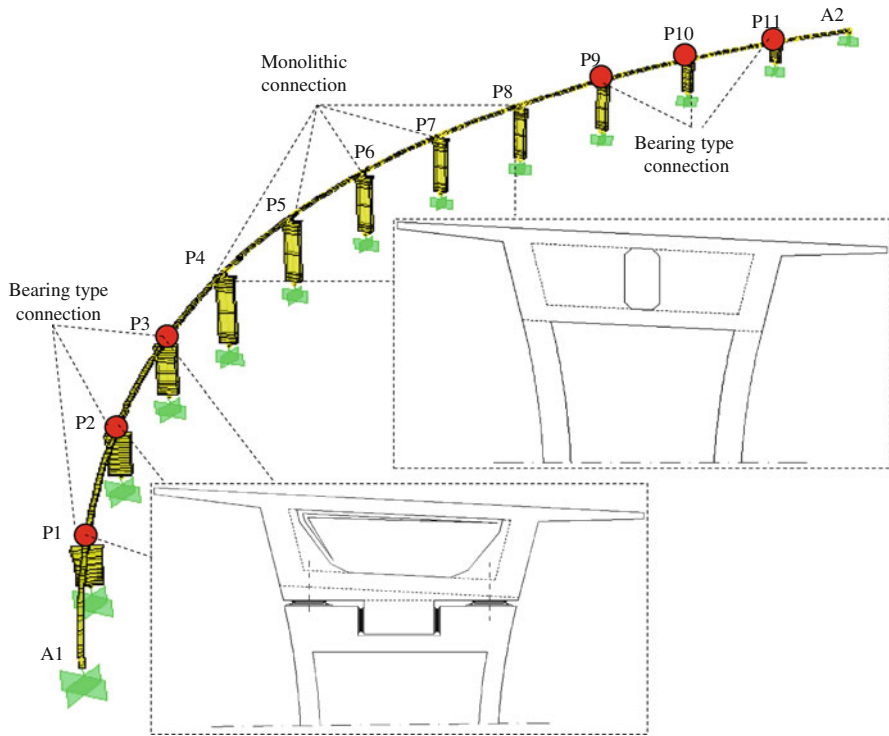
Layout of Krystallopiqi bridge finite element modelling
